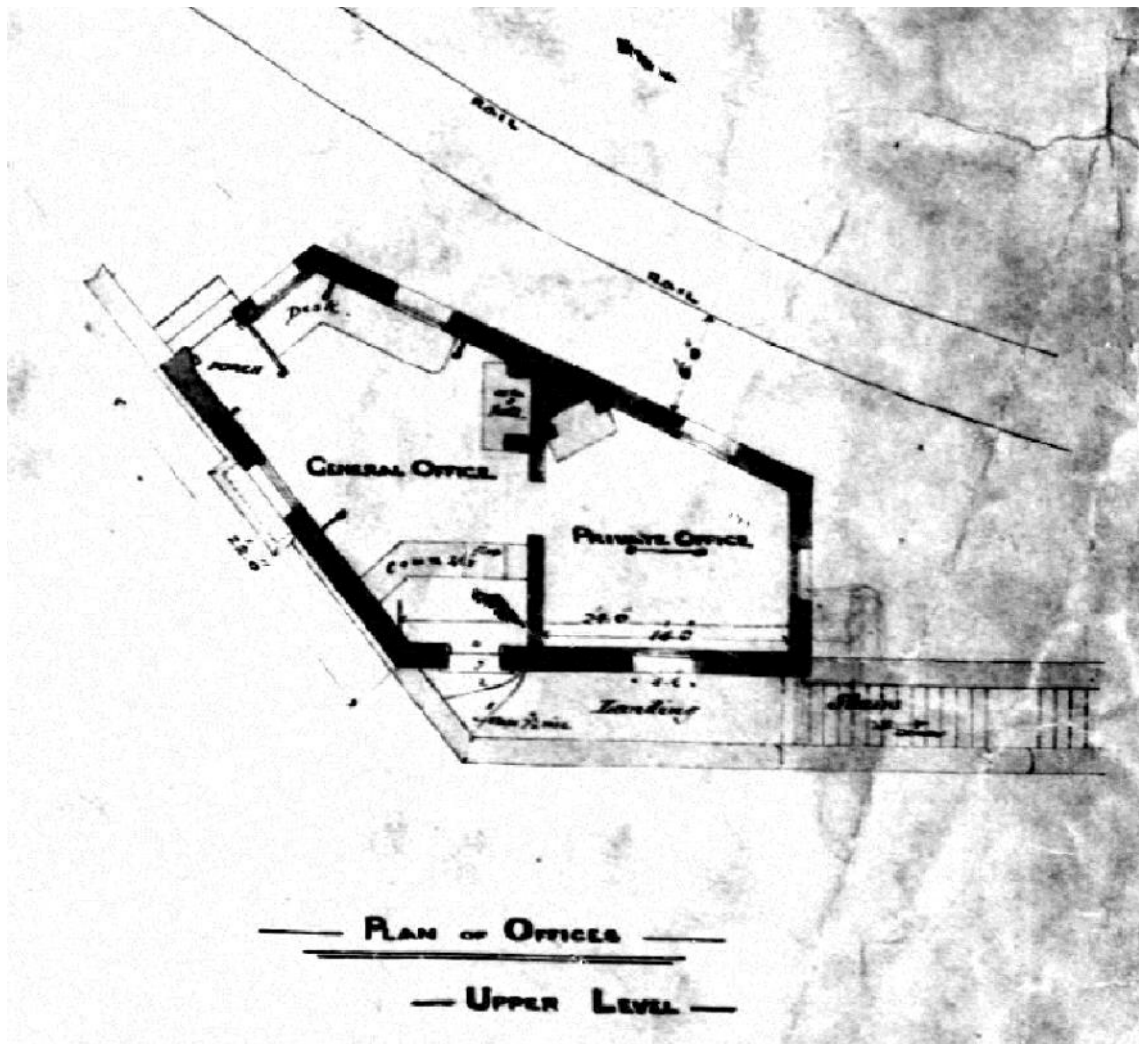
Record extract plan on office block showing coal railway adjacent on roof deck.
